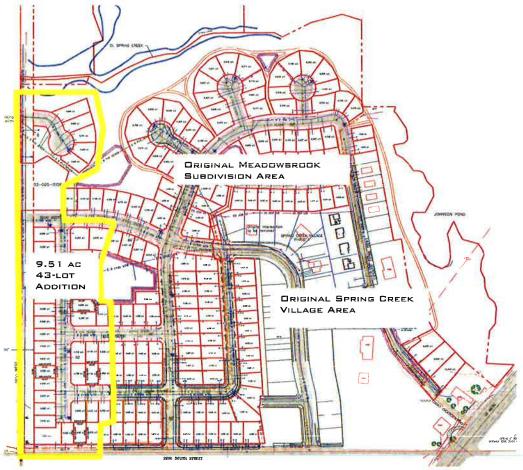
shows the 9.51-acre addition to the Meadowbrook Subdivision and the additional 1600 West ROW dedication.
